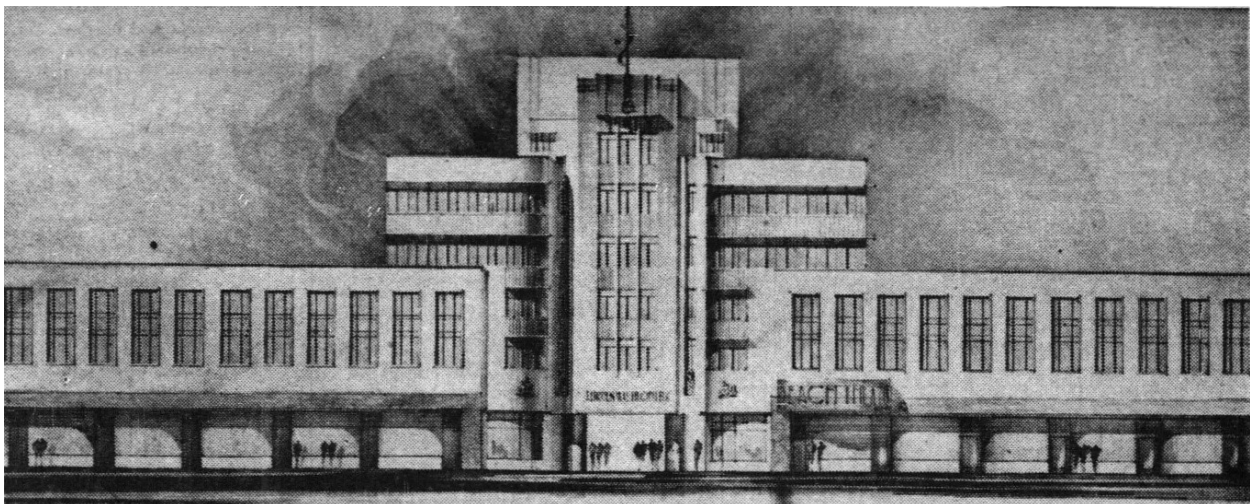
Rendering of Mercantile Bank Building, 420 Lincoln Road., Miami Beach, 1940. (Miami News, 5/12/1940, p. 30)
